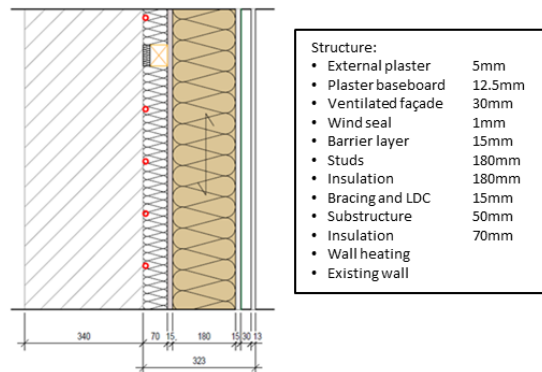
THE PRELIMINARY LAYOUT OF THE CONEXWALL WALL
